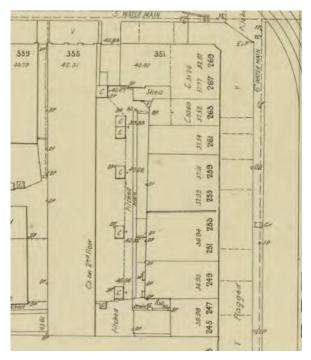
Detail of MMBW plan no. 1016, 1894 prior to the construction of the current row of three-storey buildings along Elizabeth Street
